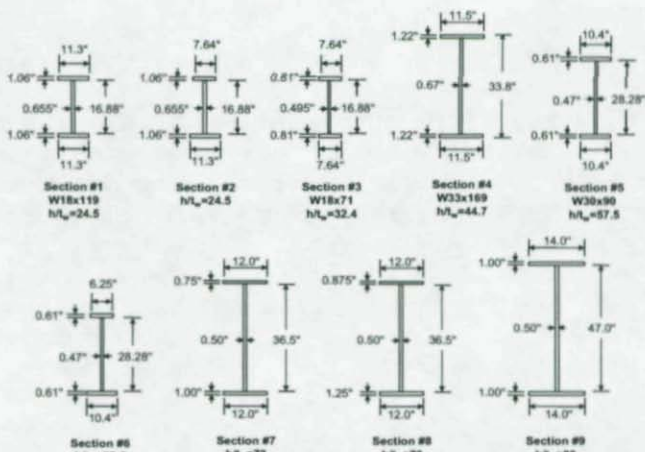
Girder Cross-Sections used in Parametrical Studies
